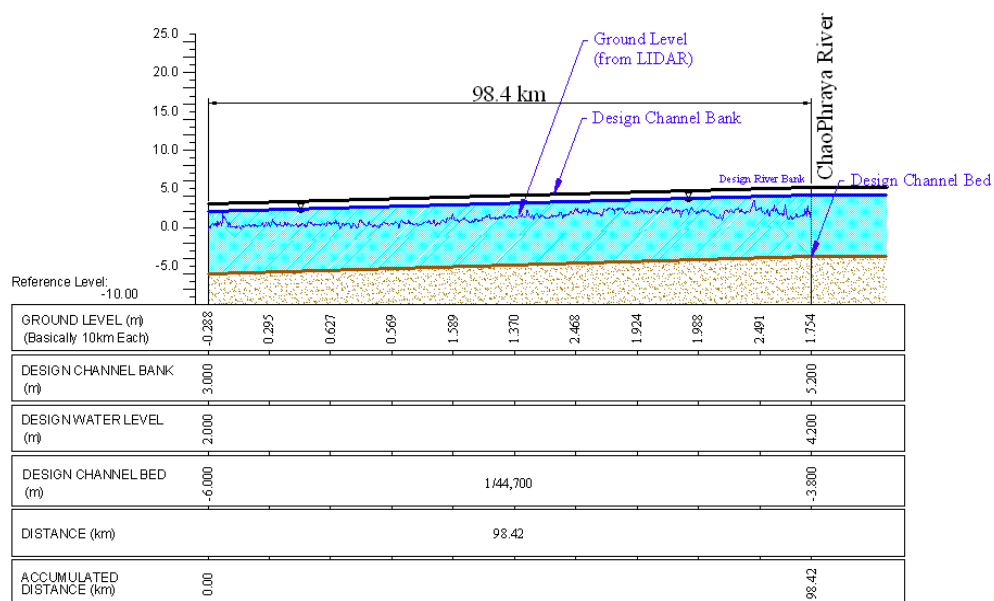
Longitudinal Section of Outer Ring Road Diversion Channel
